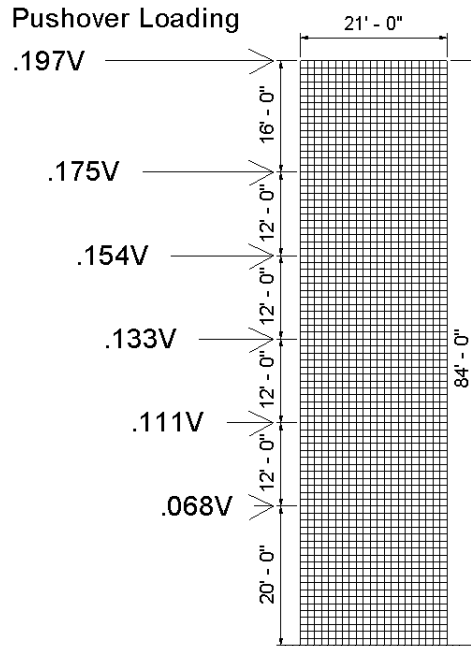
Geometry and Loading Details for Shear Wall Comparison
